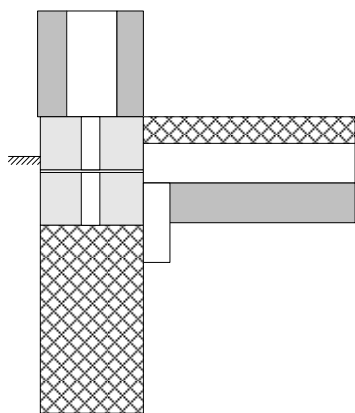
Section of a joint between the outer wall/foundation/slab-on-ground with vertical insulation inside of the foundation
